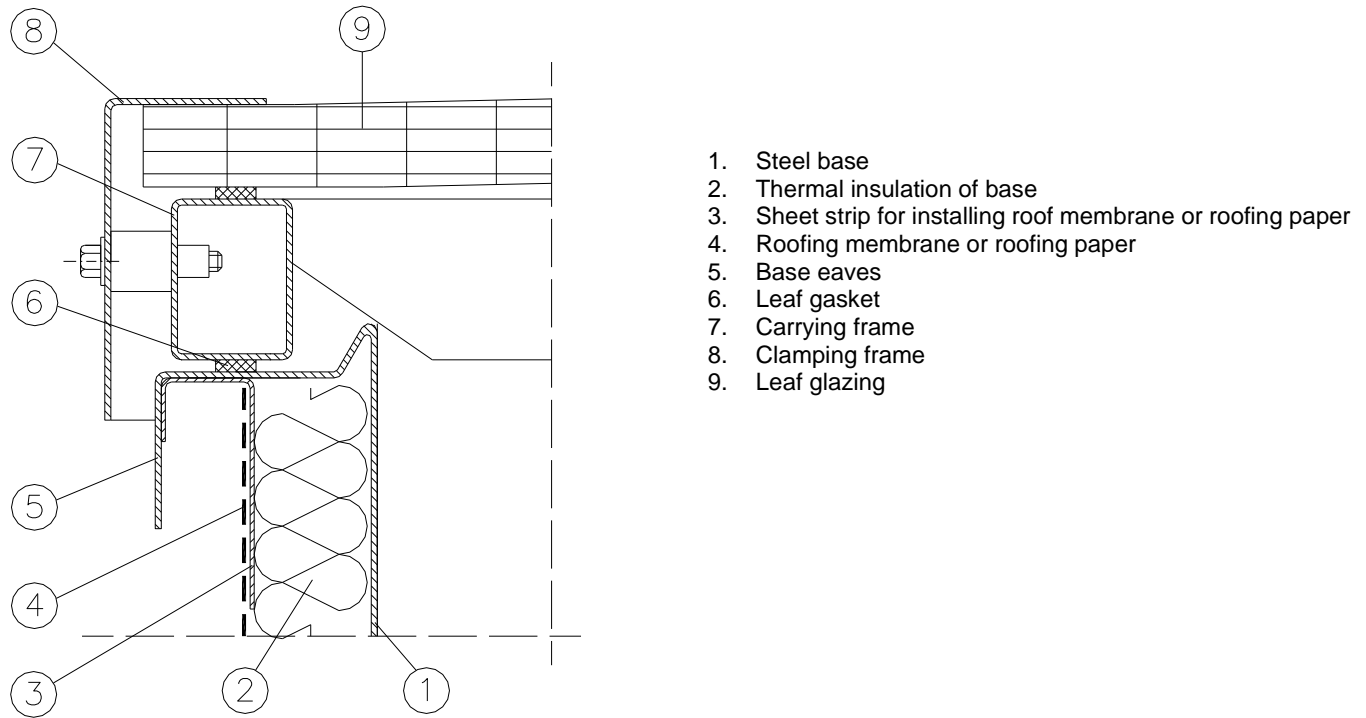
Method of sealing with roof membrane or roofing paper (detail A)
